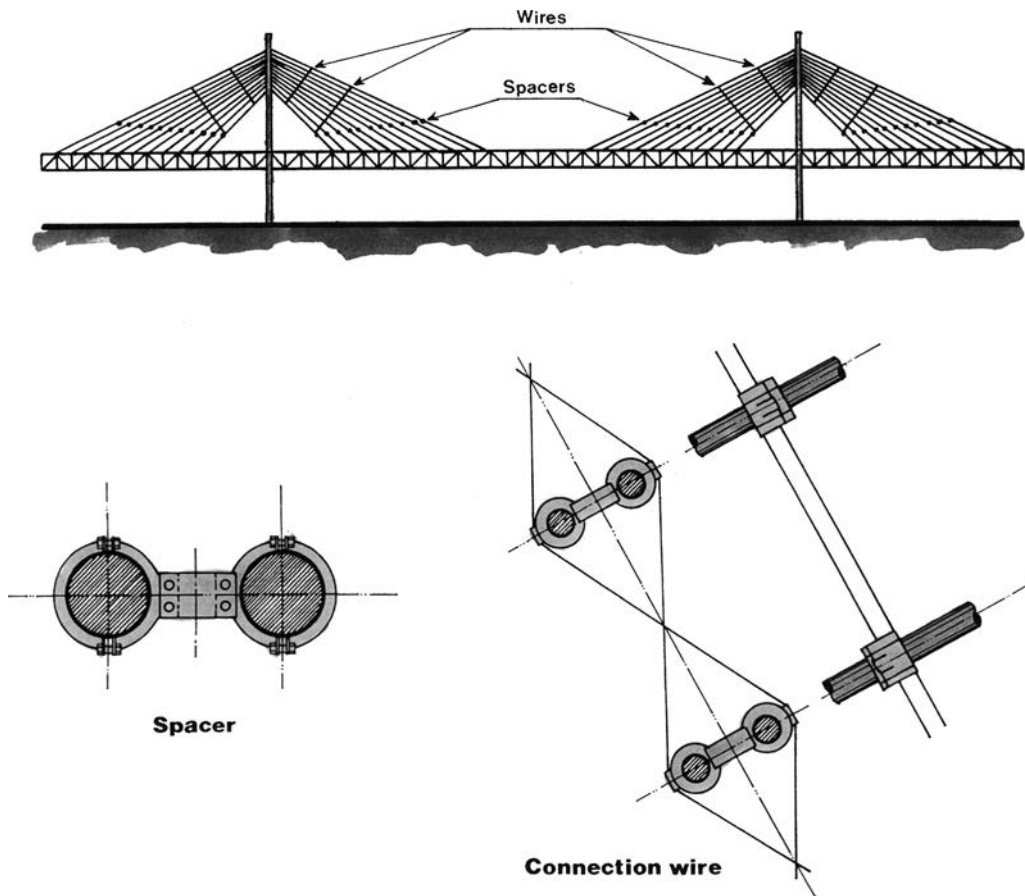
Cross cables for the cable stayed bridges on the Kojima-Sakaide route.
